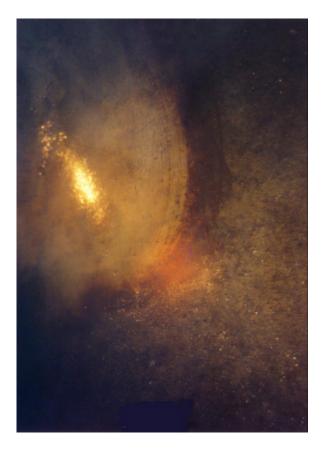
Circumferential crack and rust spotting in interior of 72" P.L. south of Location 1.
